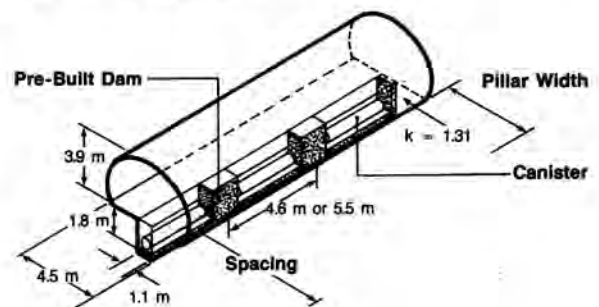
Alternative 10: Trench-in-Drift-Floor Waste Emplacement Configuration.
